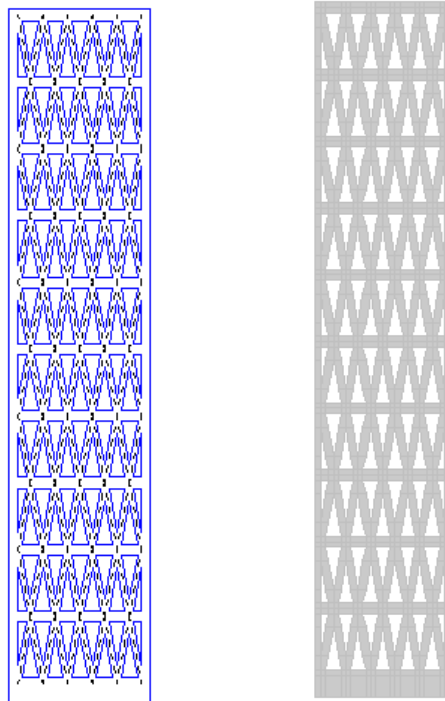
Panel configuration: left – structural detailing of the panel in Cad software; right – the adapted model as a structural element to building modeling (source: the author)
